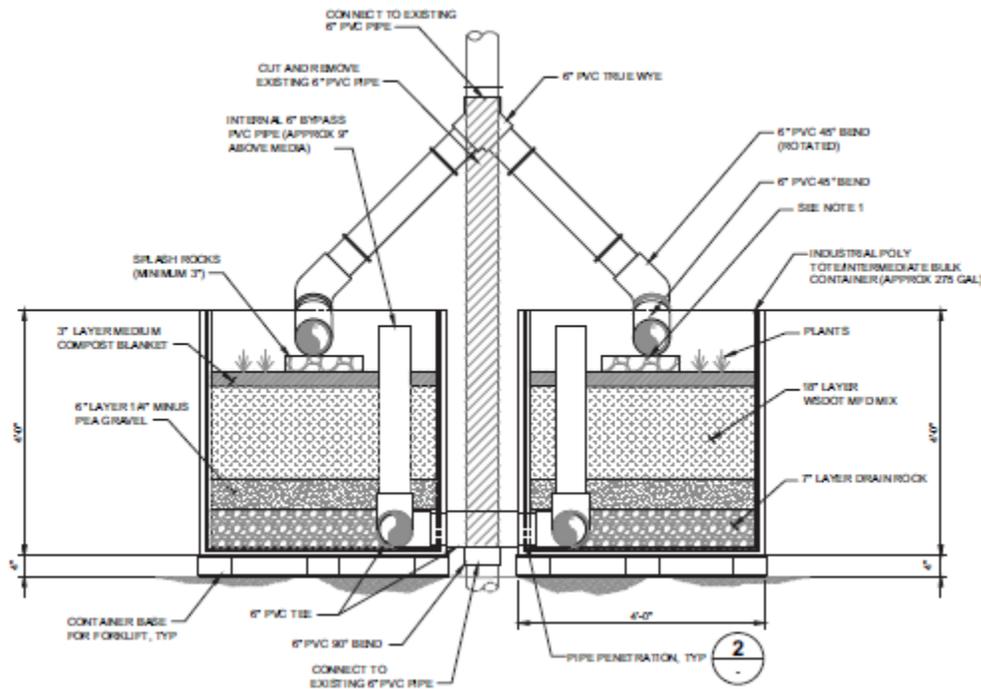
Existing Roof Downspout MFUs on Warehouse 1.
